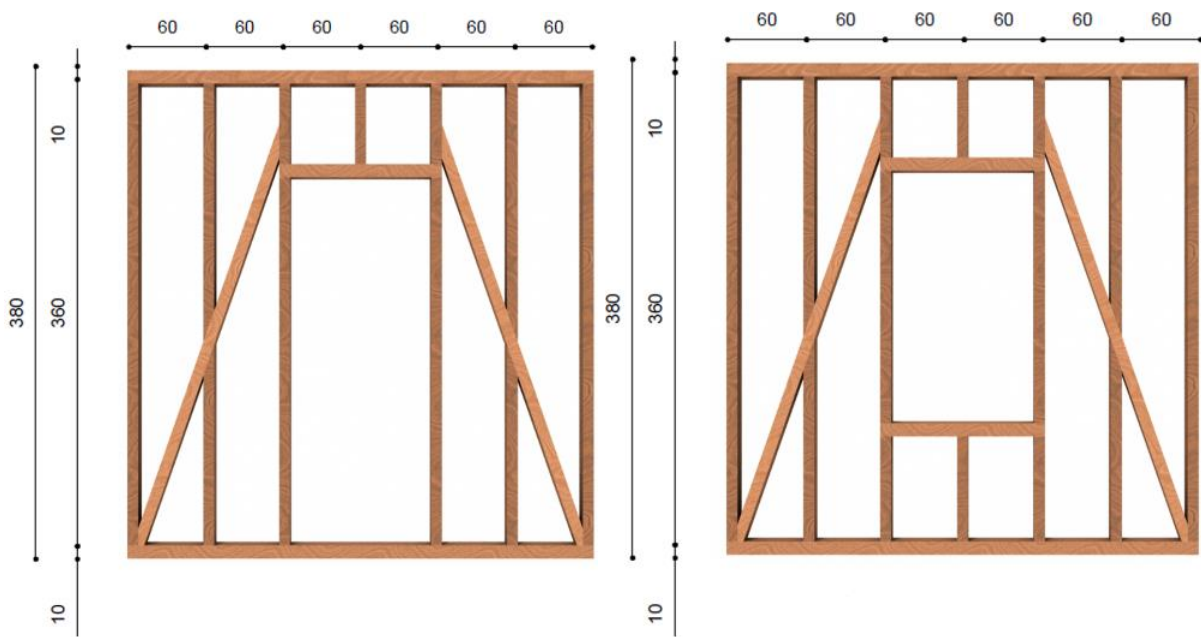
Shear walls: (a) Typical shear wall with a door opening. (b) Typical shear wall with a window opening. Dimensions in cm.
